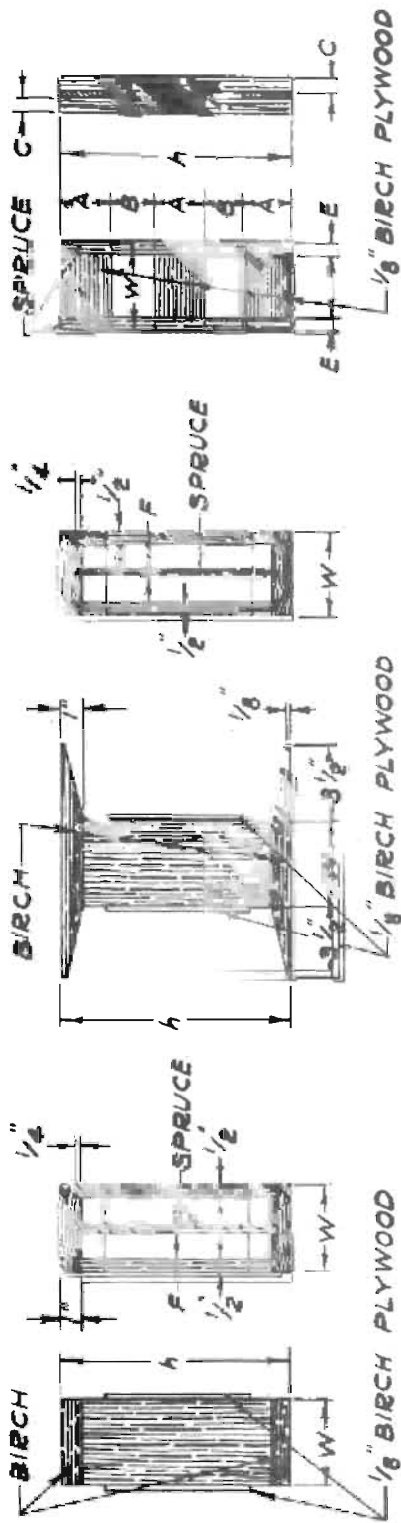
Construction details (beam assemblies) of box beams for repeated and reversed loading.
